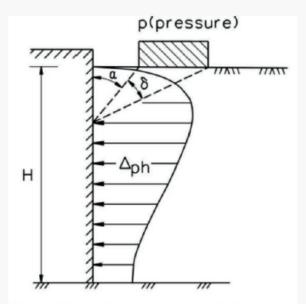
Horizontal Pressure on Wall Caused by a Uniformly Loaded Strip
